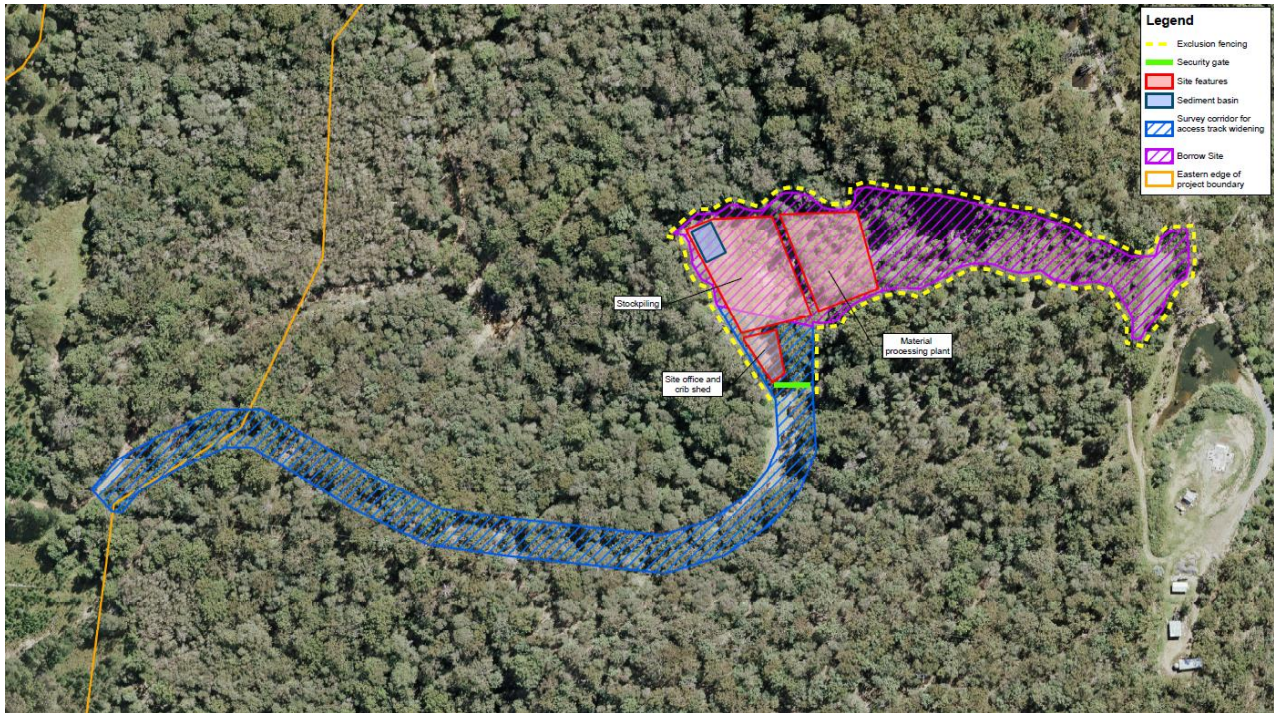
Layout and extent of the proposed Tyndale Borrow Site
